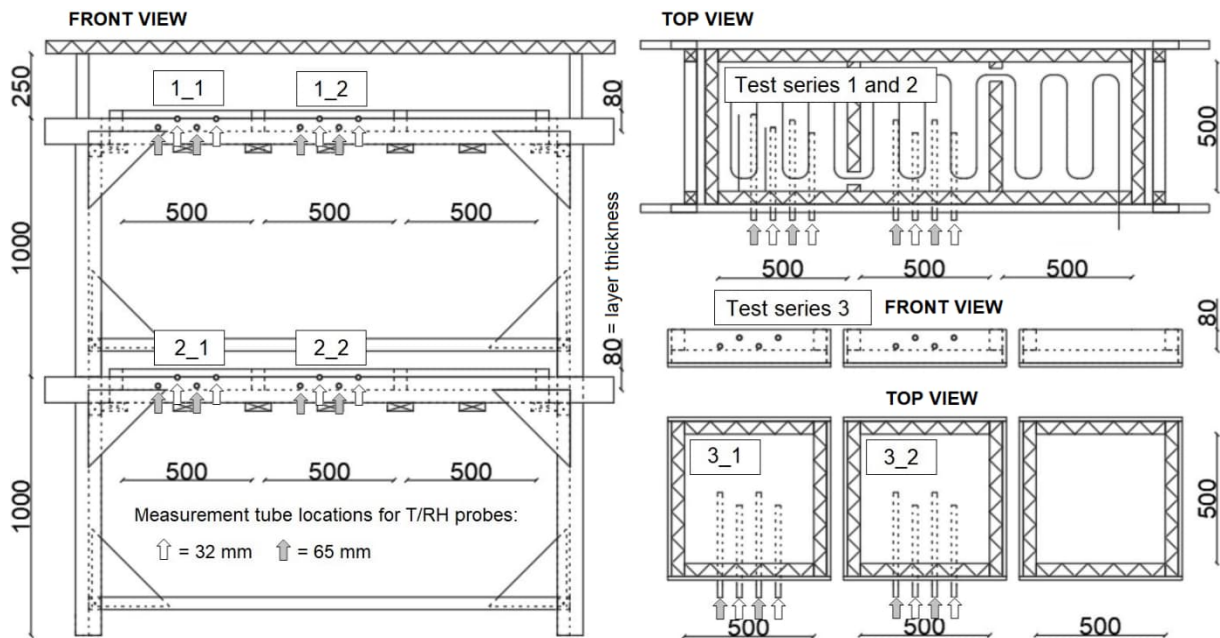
Drawings and dimensions of the casting molds. Measuring tubes in two measurement depths are marked with arrows. Dimensions of all the test structures are 500 mm * 500 mm * 80 mm.
